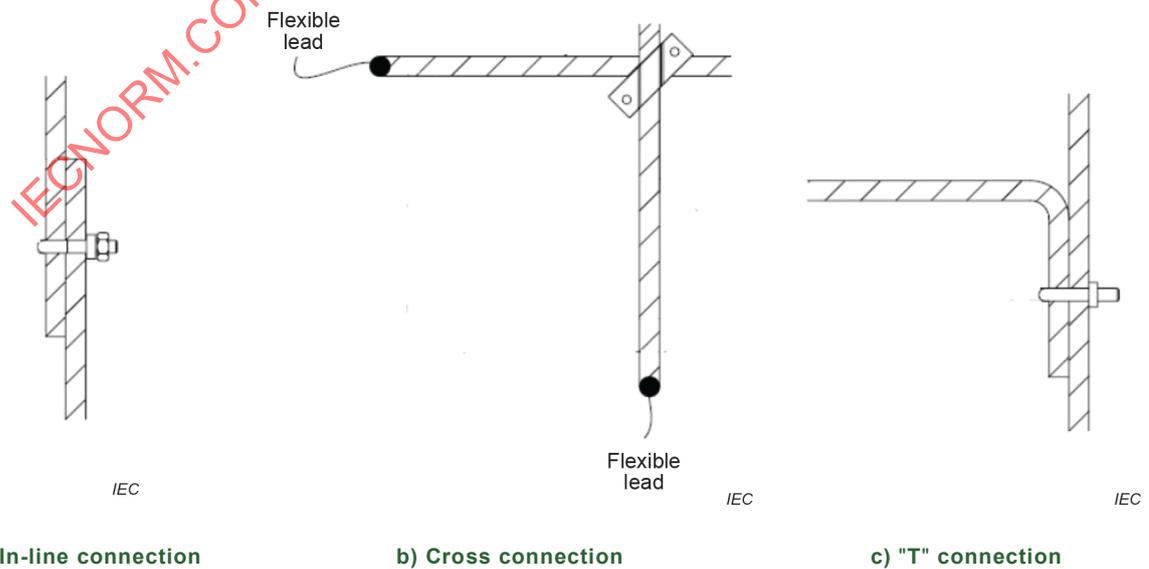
Basic arrangement of specimen with clamped connection of reinforcing rods
